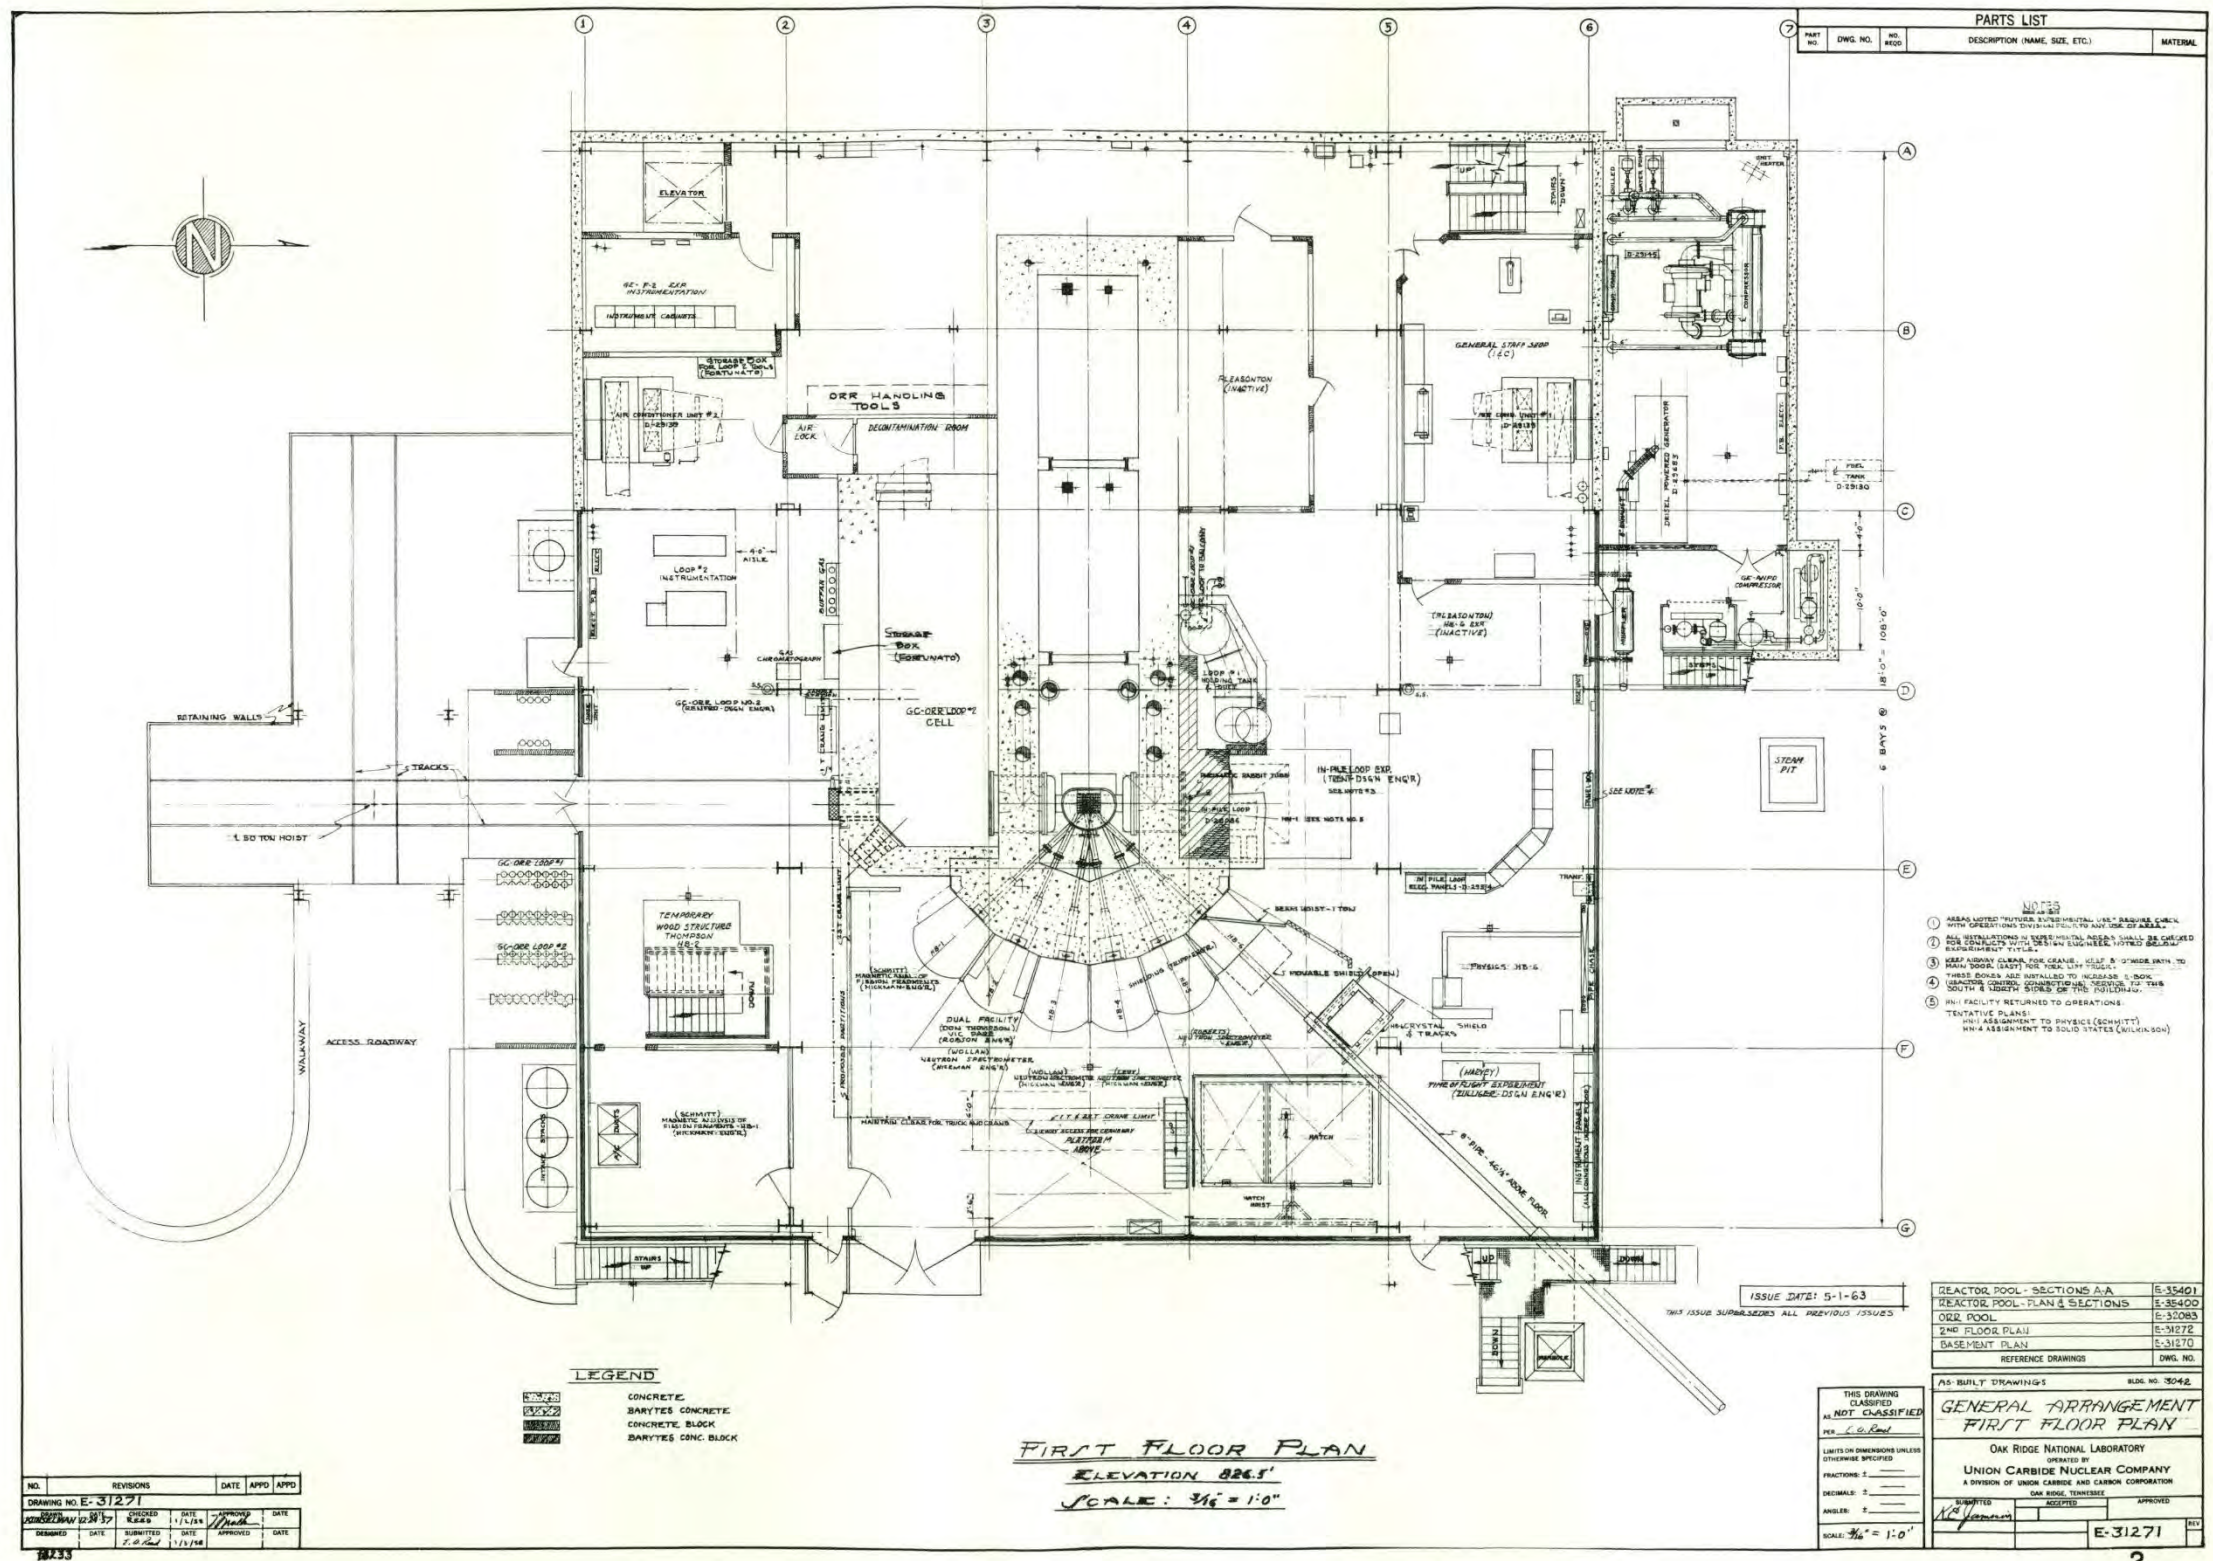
As built drawing showing the general arrangement of the first floor plan in Building 3042 (Oak Ridge National Laboratory, December 24, 1957 [drawn date], May 1, 1963 [issue date, with revisions]).
